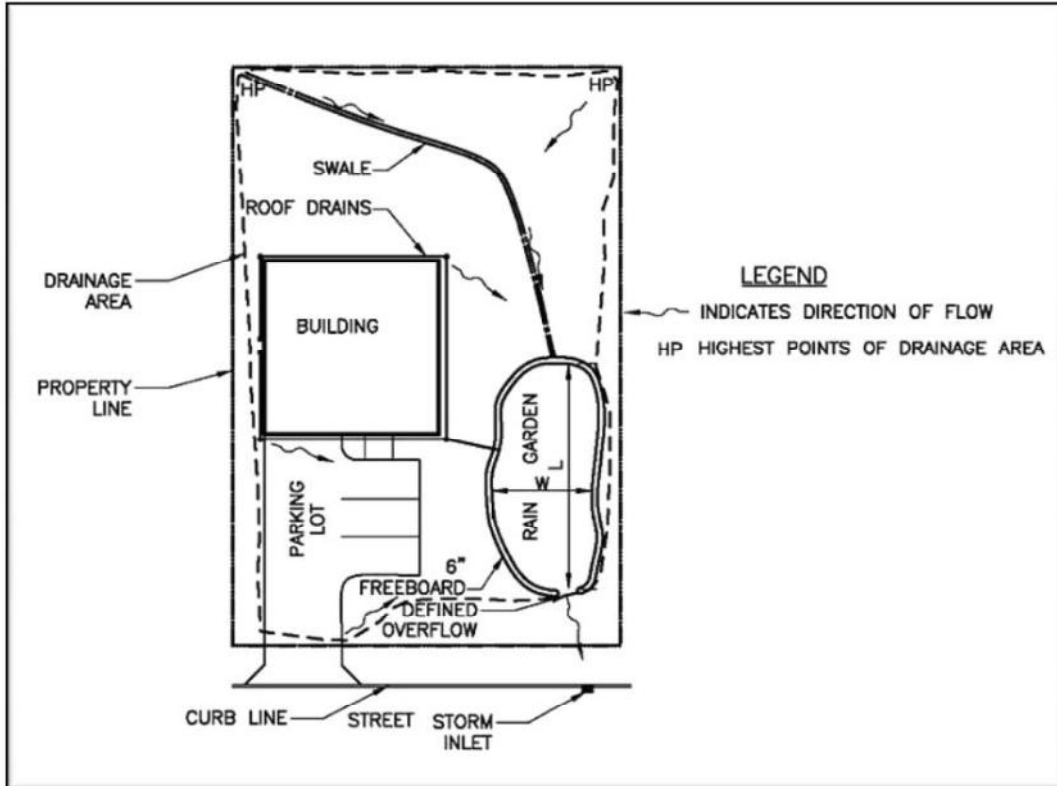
Position of Rain Garden with respect to Building Foundation and Drainage Area
